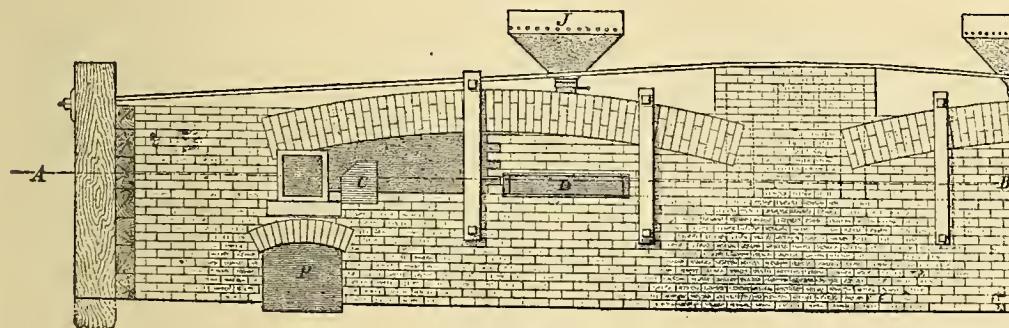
PLAN OF ROASTING FURNACE ON LINE A B.
